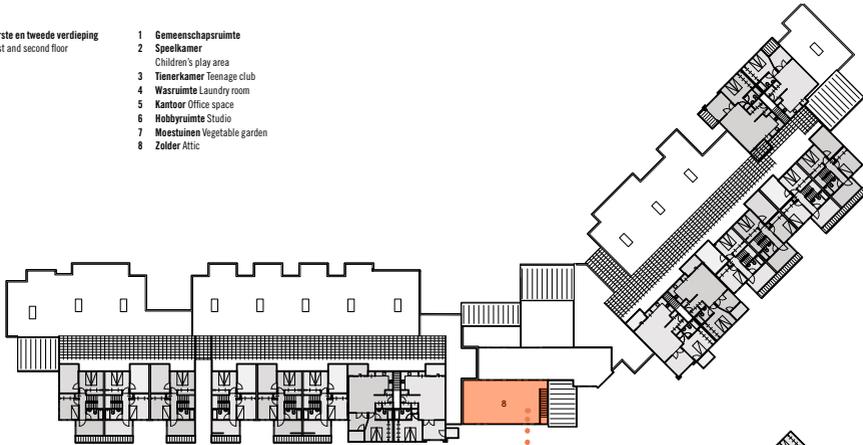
Floor plan second floor (Van Der Putt, 2013)
